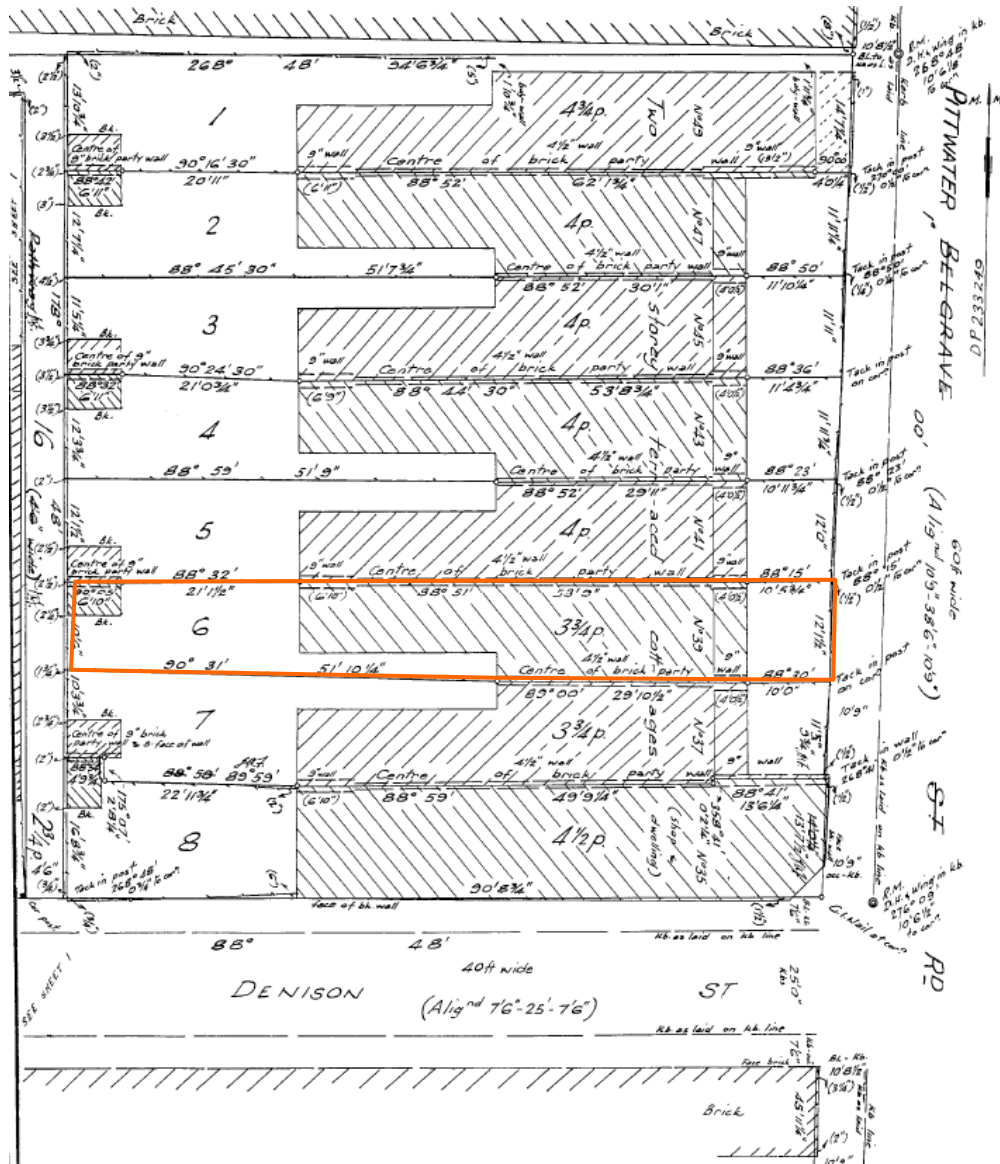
Subdivision Plan of Pittwater Road Row House group at the time of subdivision in 1967. No 39 outlined.
